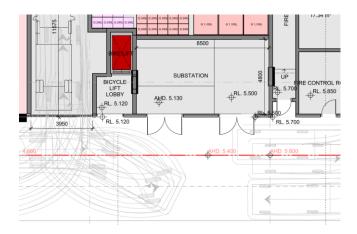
Doors opening to Middleton Lane will obstruct laneway
